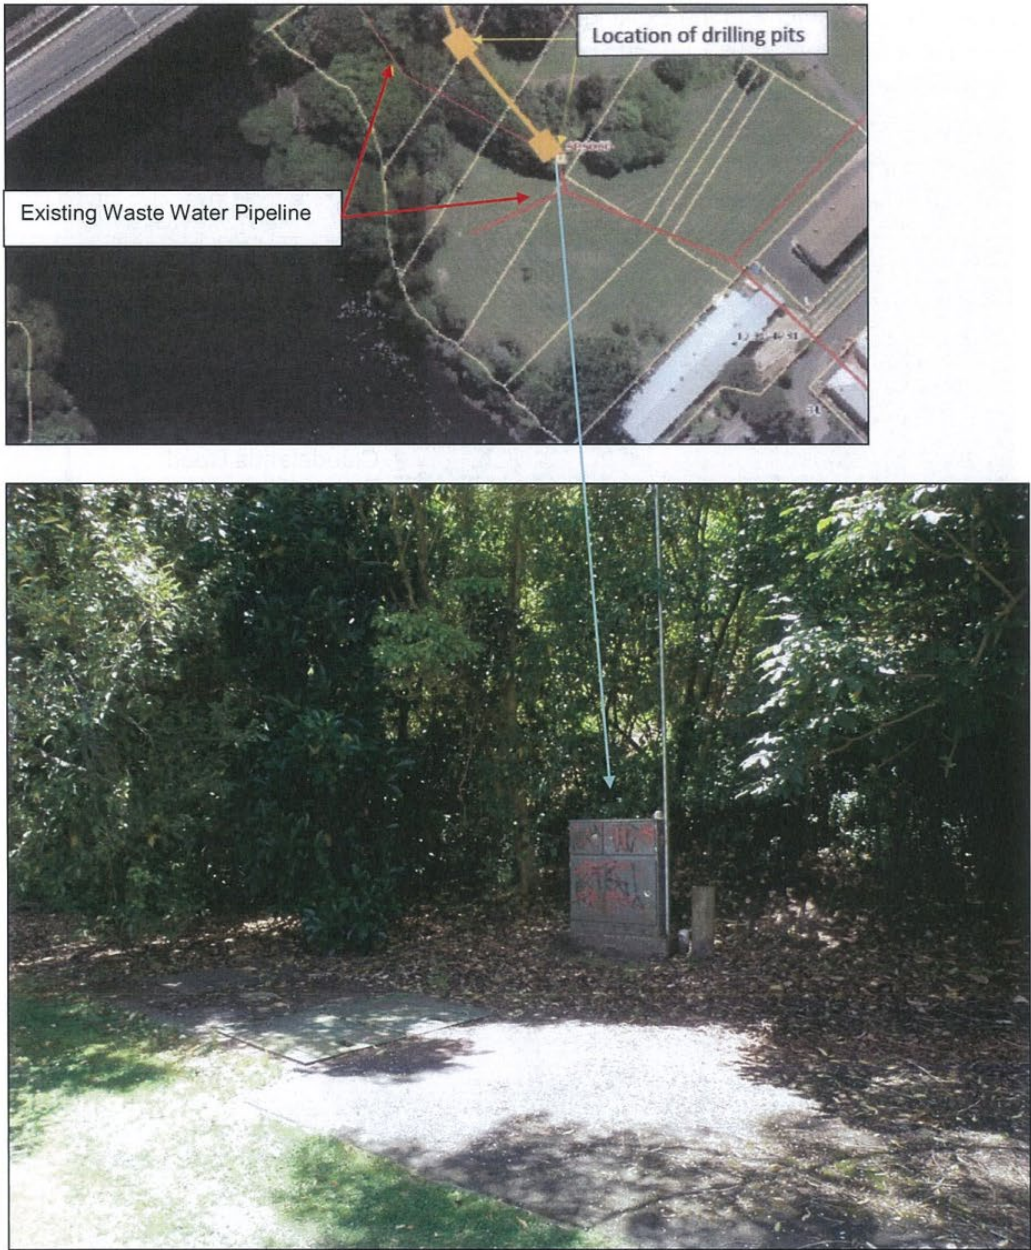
SOUTH END OF PIPELINE CONNECTION POINT IN JESMOND PARK
